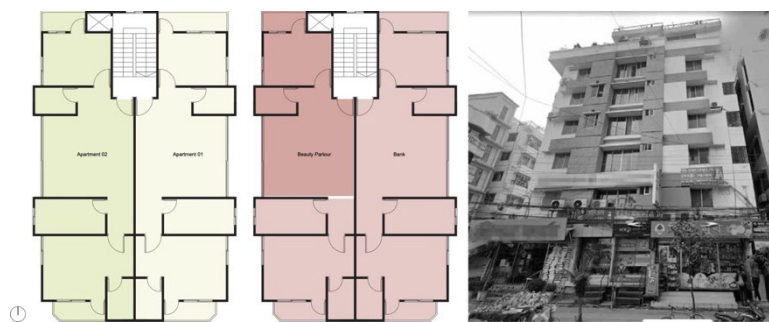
(left) Original (adopted by observation) two unit apartment plan ~1600sft, (middle) Adapted plan for a Beauty Parlour ~450sft and Bank ~1200sft, (right) the exterior view of the typical east view (Source: Author)
